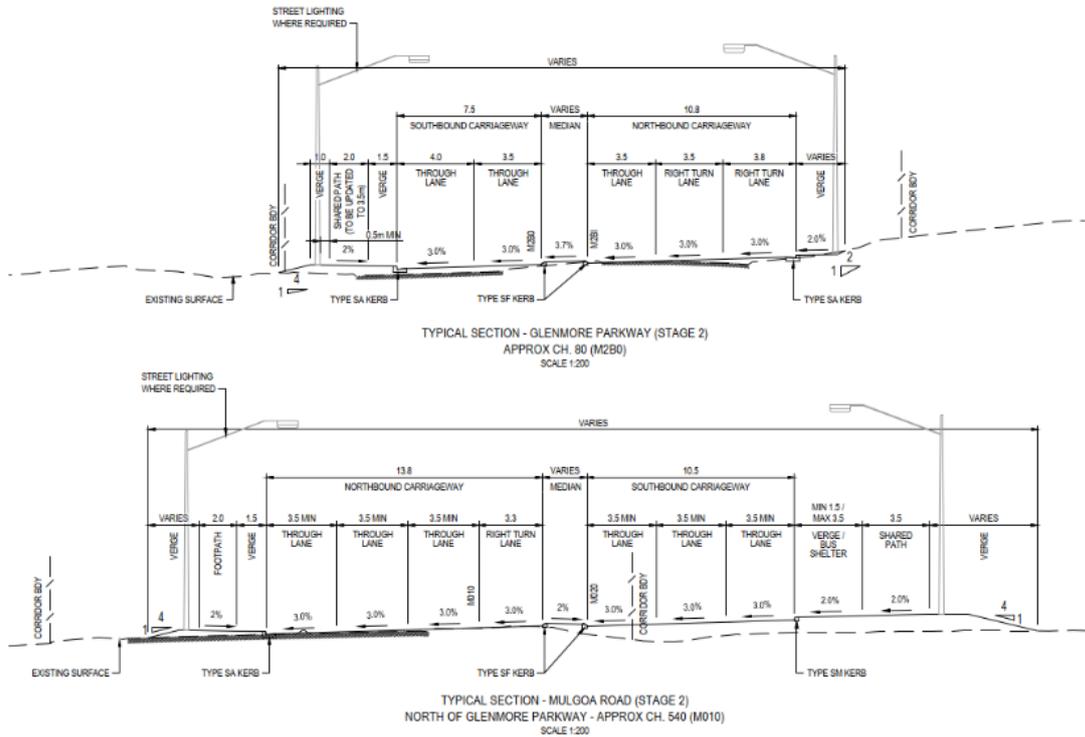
Typical cross sections of Mulgoa Road (between intersections) between Glenmore Parkway and Jeanette Street
